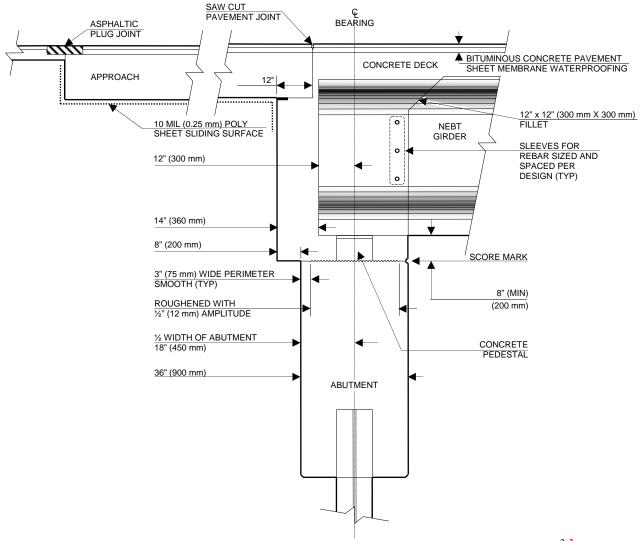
Bridge End Detail Type A (Prestressed Concrete NEBT Girder)^{2,3}
